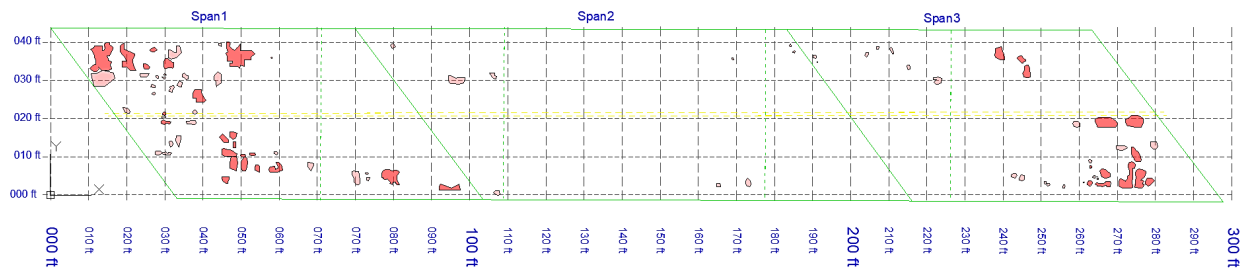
Existing Delamination in the Bridge Deck No. 22451
